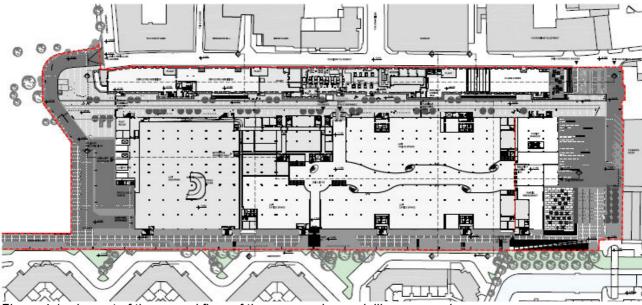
Layout of the ground floor of the proposed remodelling proposal
